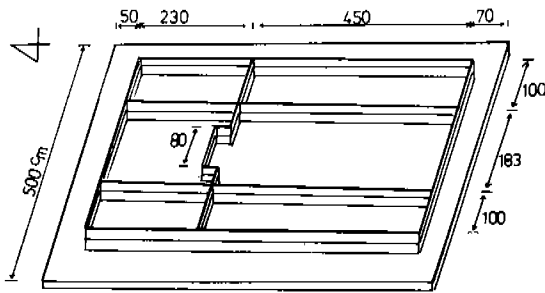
Foundation of greenhouse bulk curing and drying system.
